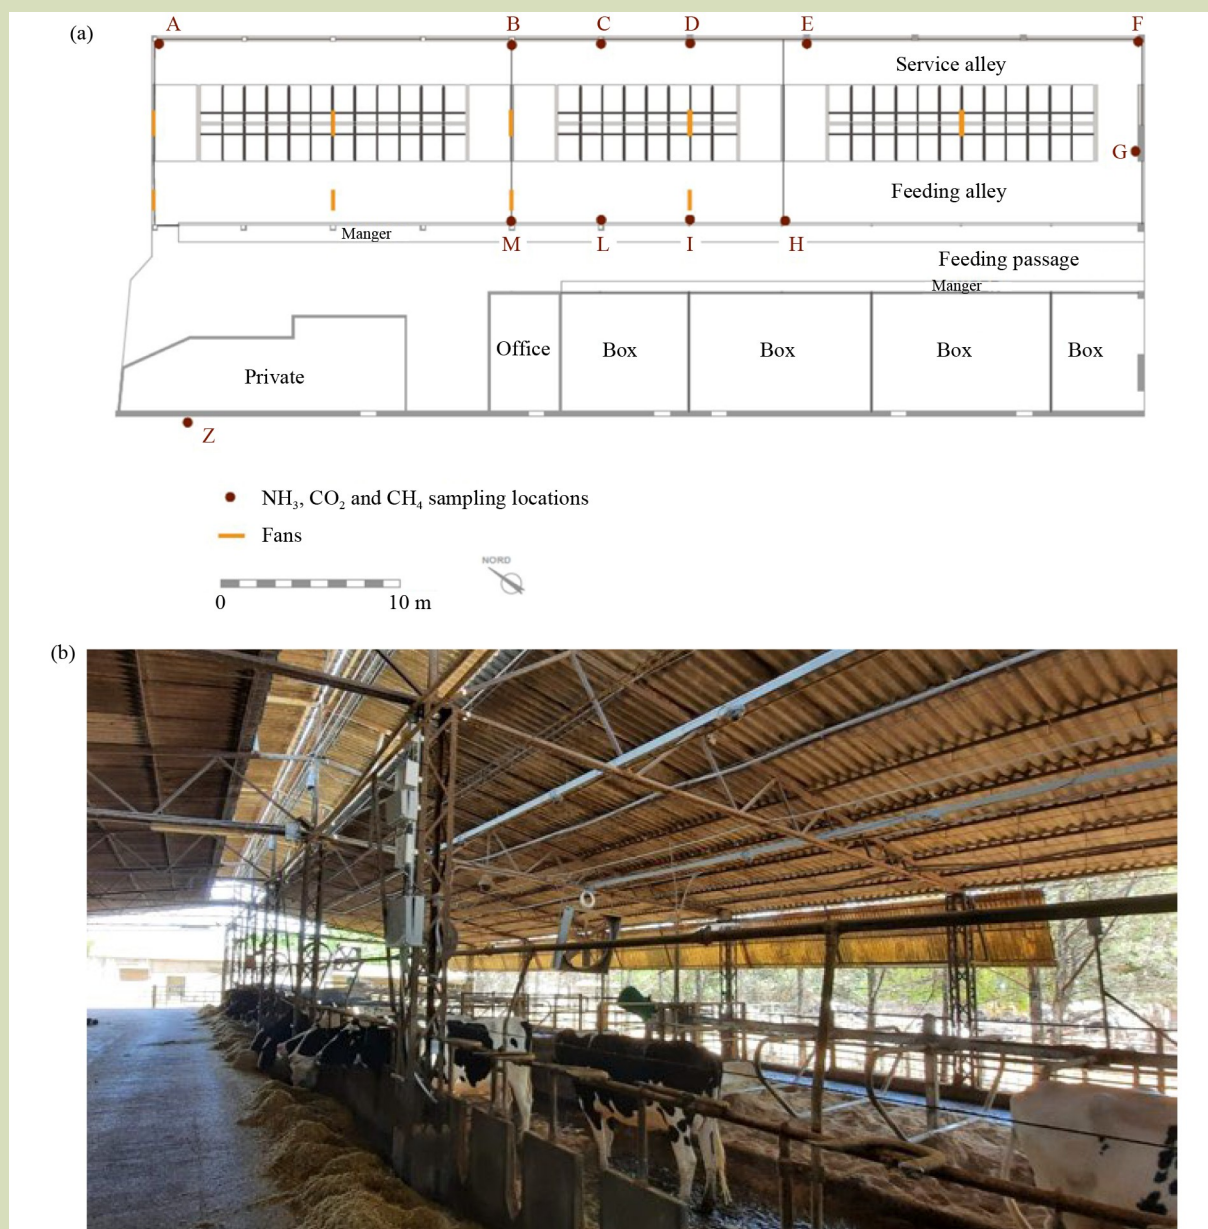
Plan of the barn studied (a) and indoor view of the barn with two open sides (b).
